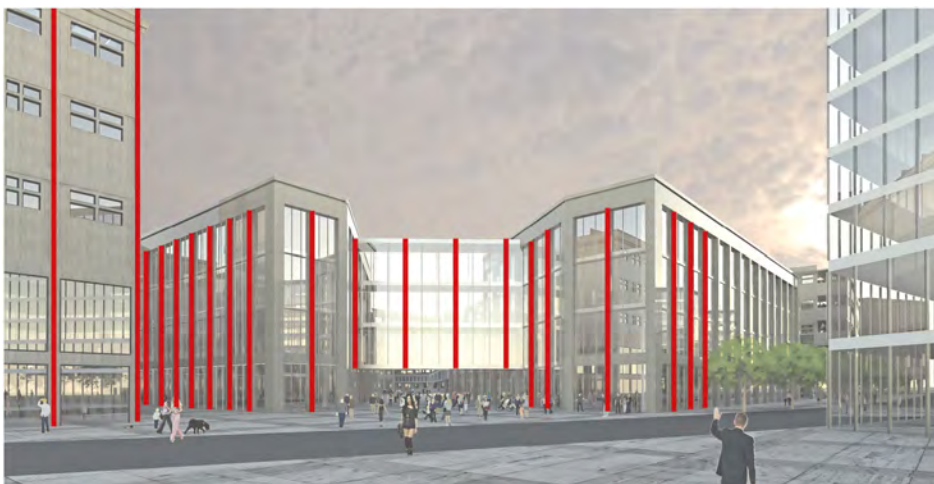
Reconstruction design of the glass curtain wall of the new building of Nanjing Hutchison factory (Source: Zhou Qi studio design)
